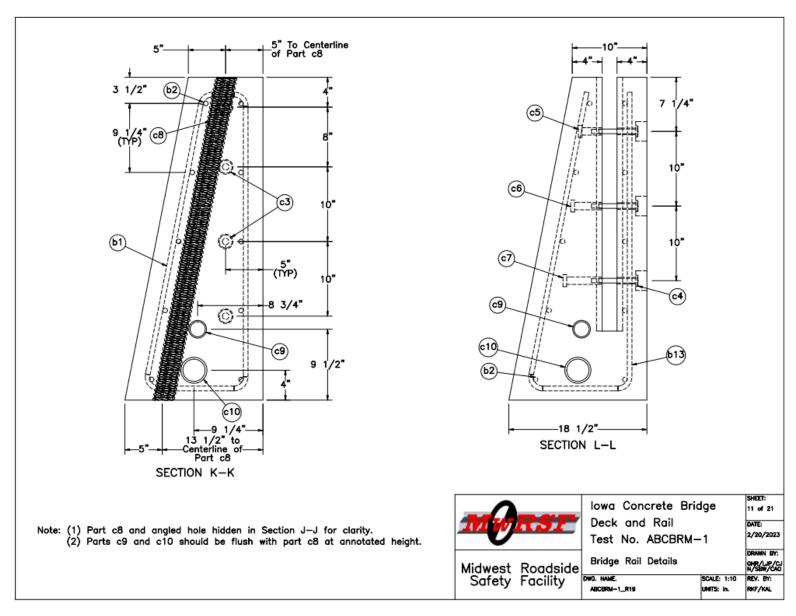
Bridge Rail Details, Test No. ABCBRM-1
